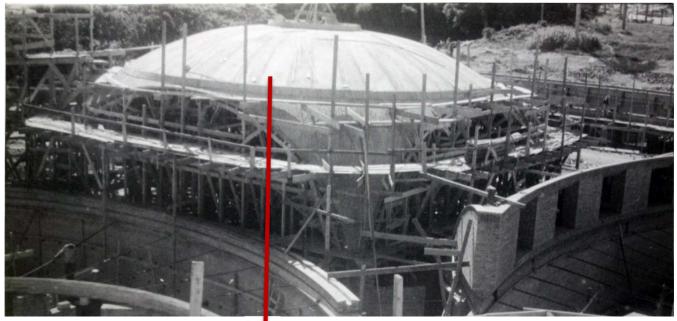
Dance pavilion: view of the dome after the second concrete casting (ISA archive).
